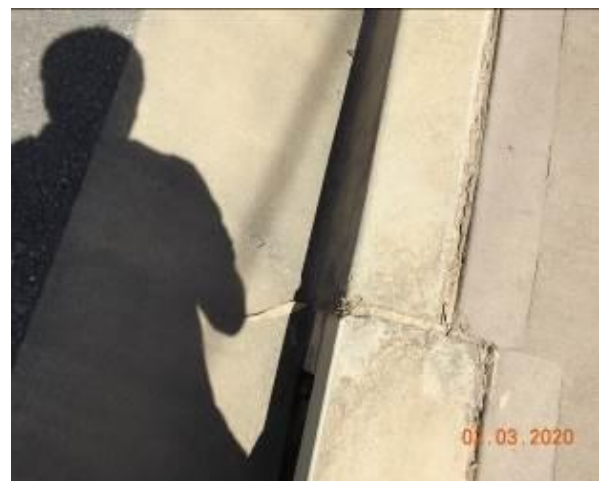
Crack propagation through stormwater inlet pit
